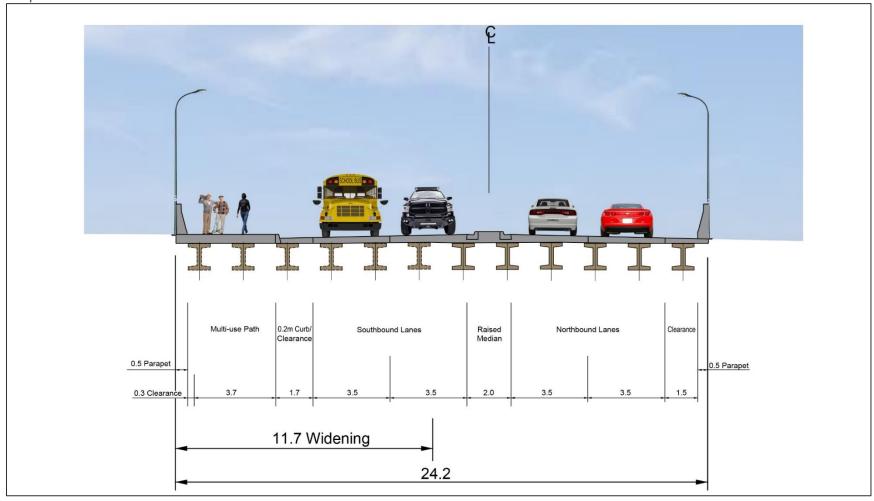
MTO Structure 4 - Ninth Line over Ramp 403S-407N and Ramp 403E-407N
